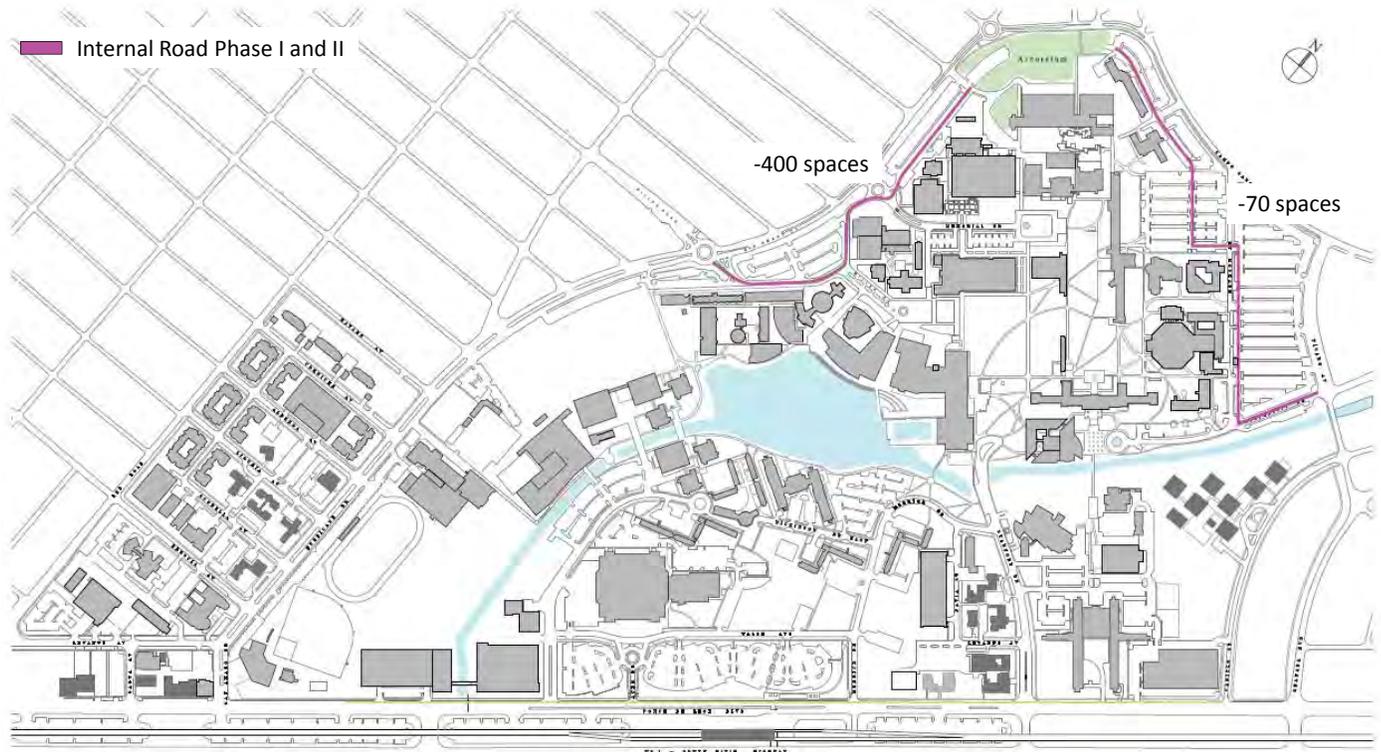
Exhibit D: Internal Road Phase I and II - Proposed Phase II Route and Location of Eliminated Spaces
